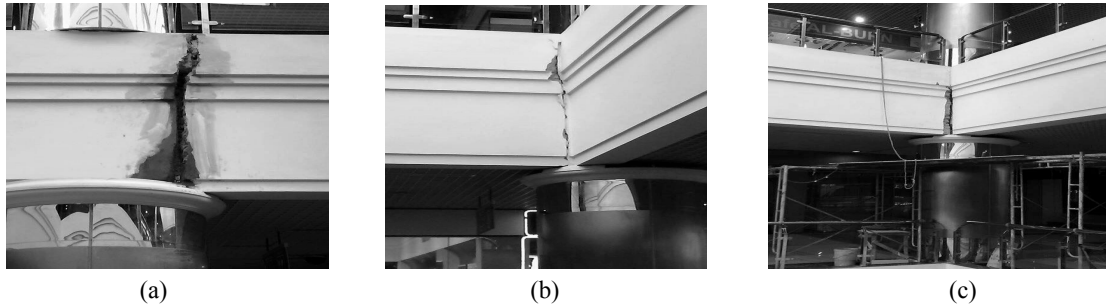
Cracked Beam-Column joints of Jamuna Future Park Shopping Center
